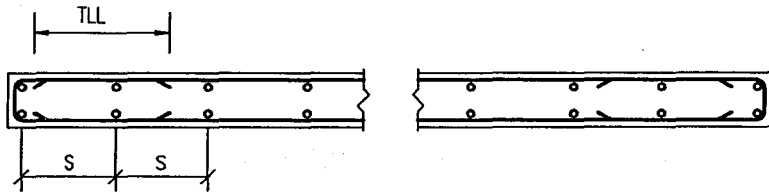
TYPICAL DETAIL OF COLUMN BINDERS
